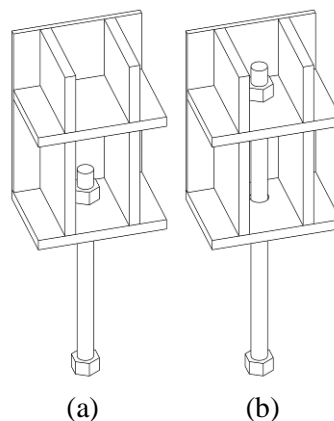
Anchor bolt chairs: (a) conventional anchor bolt; (b) anchor bolt with stretch length
